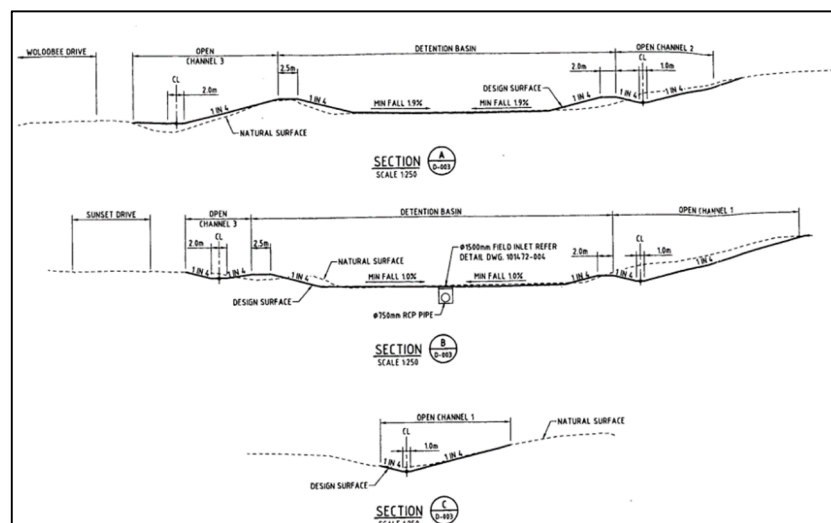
Cross section of the vegetated swales No 1 & 2 extracted from the "As Constructed" drawings provided by TRC ([RMA, 2011](#))
